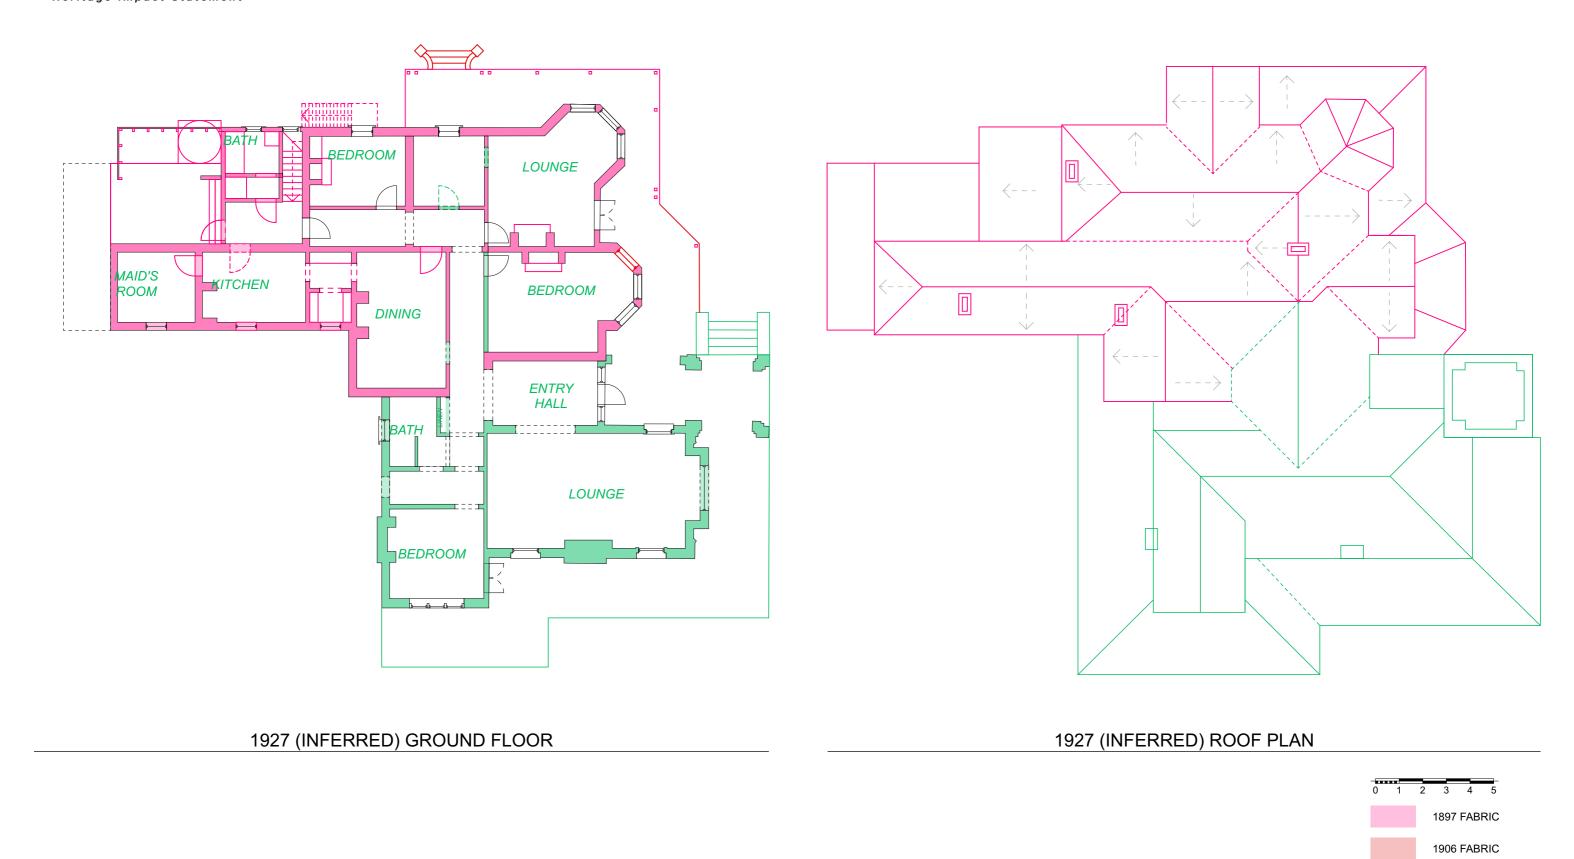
52 The Esplanade, 1927, Floor and Roof Plans. (Source: Palassis Architects 2023)
